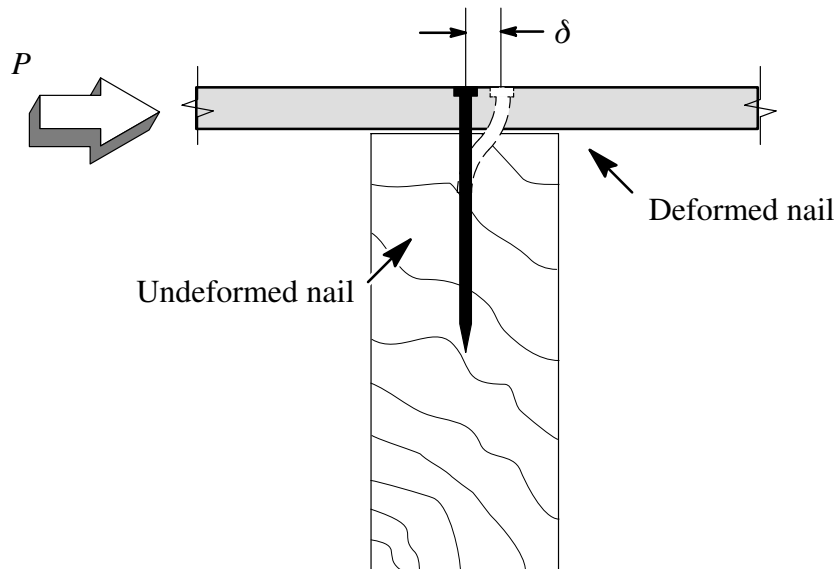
Lateral deformation of a basic panel section in a wood shear wall or diaphragm
